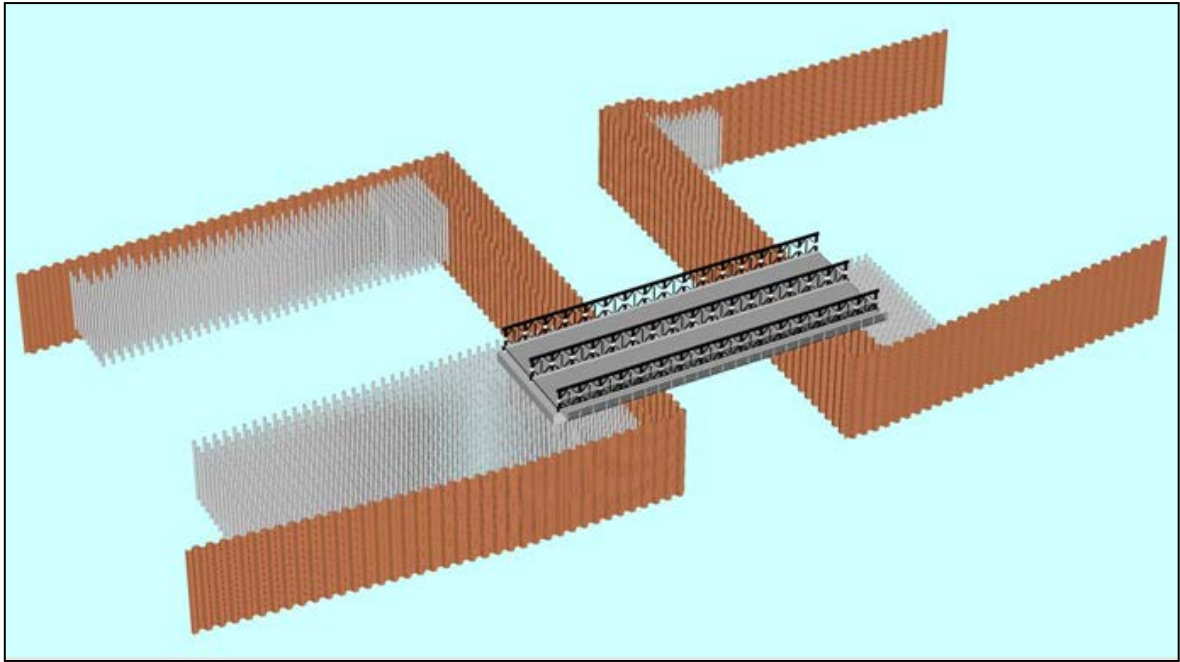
Model view of modular bridge, sheet piling, and CMCs
